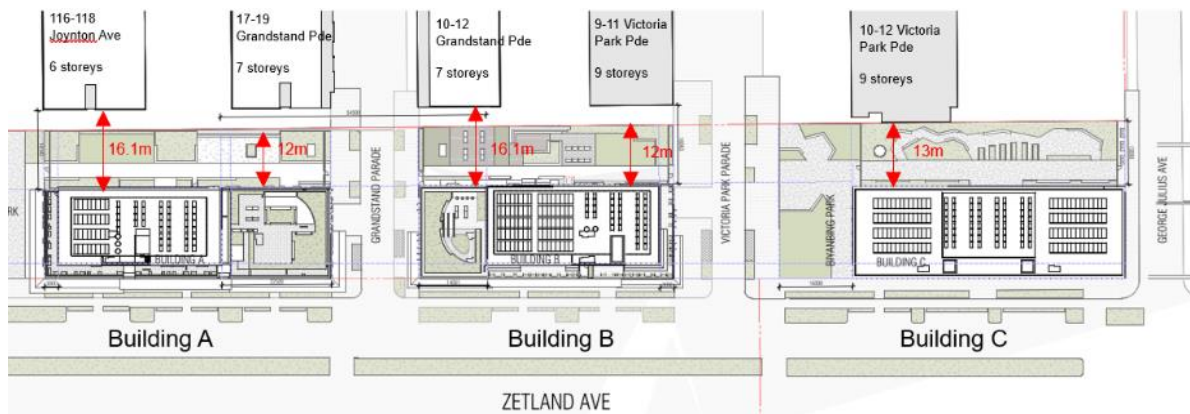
Plan of Buildings A, B and C with building separation distances in red
